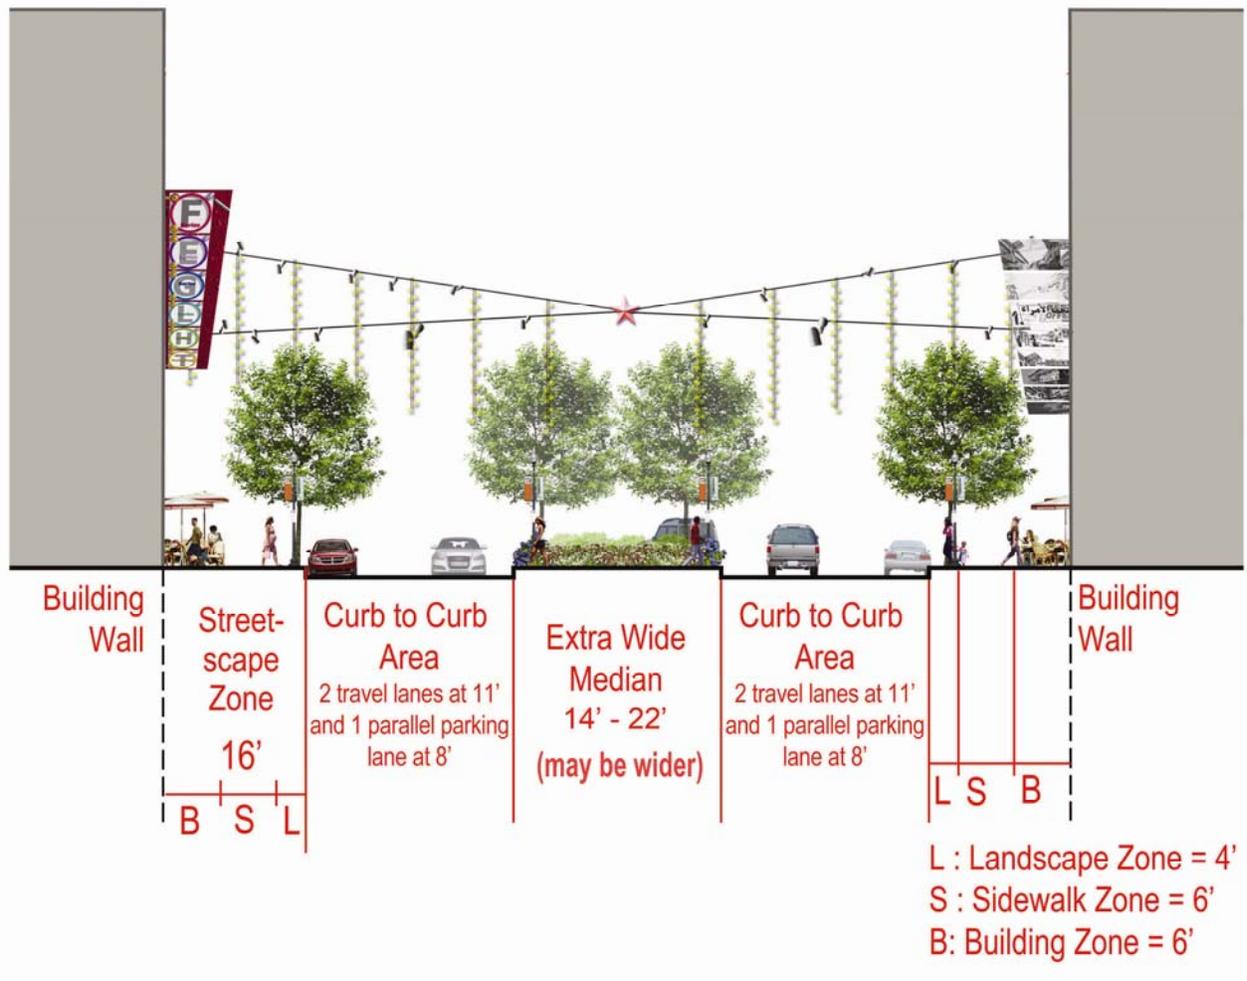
SEMINARY ROAD STREETSCAPE SECTION
